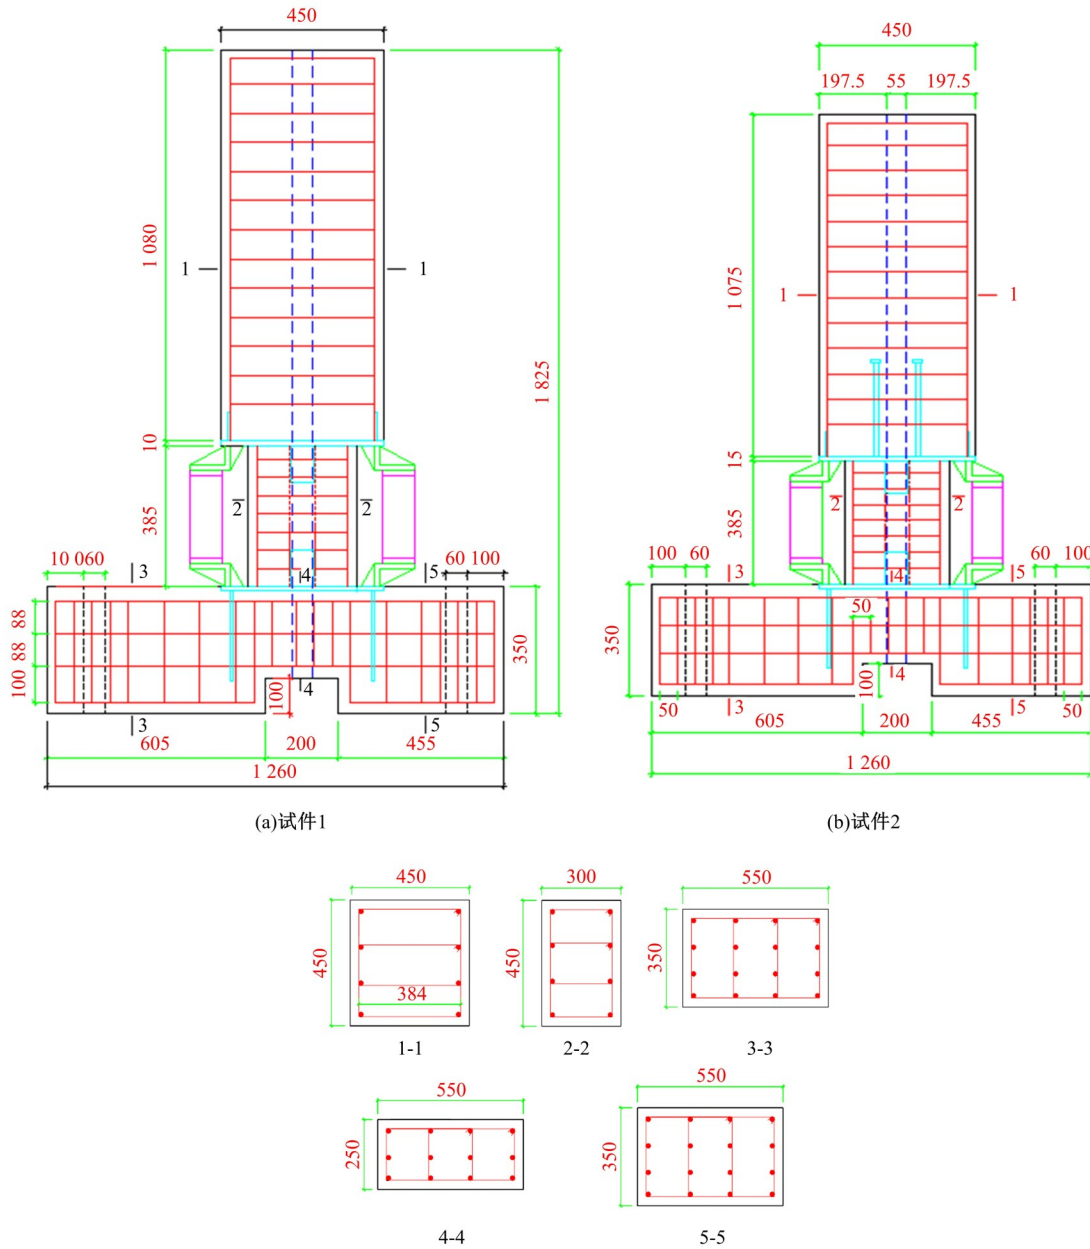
Schematic diagram of connection structure for assembled pier with external corrugated steel plates
